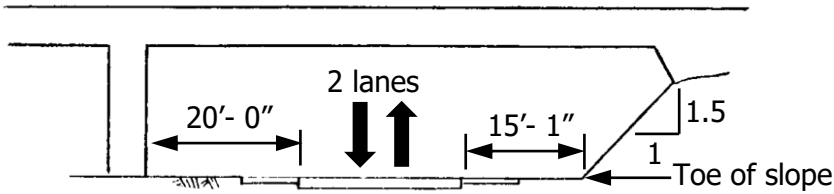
Bridge elevation view of horizontal clearances for a 2-lane highway feature with 2-way traffic below the bridge.
